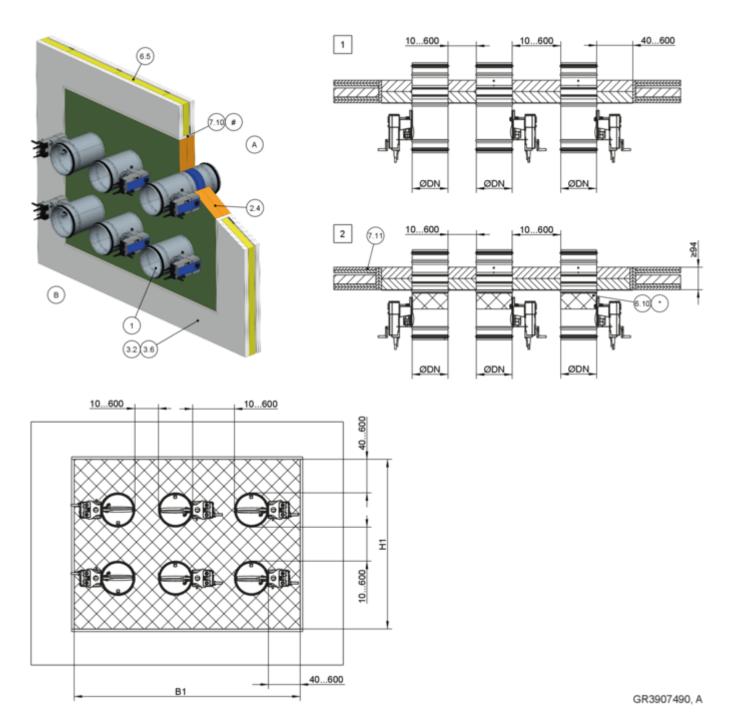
Dry mortarless installation with fire batt in lightweight partition wall - Multiple occupancy of an installation opening
